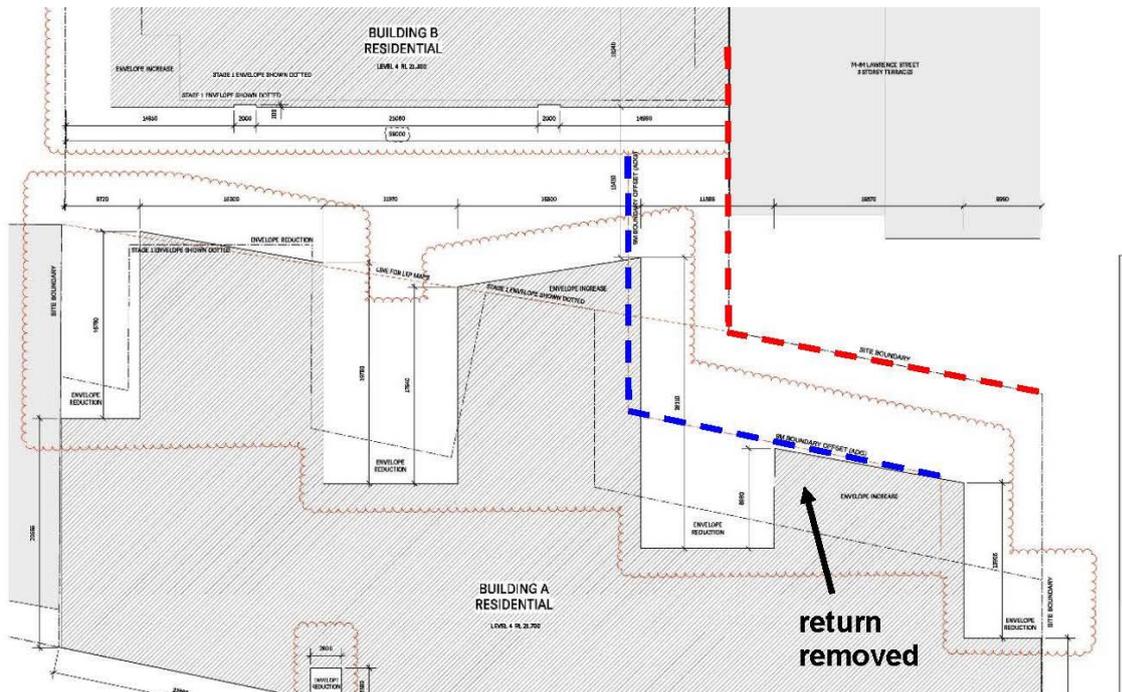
Building A - Level 4 amended modification envelope with ADG building separation in blue and site boundary in red
